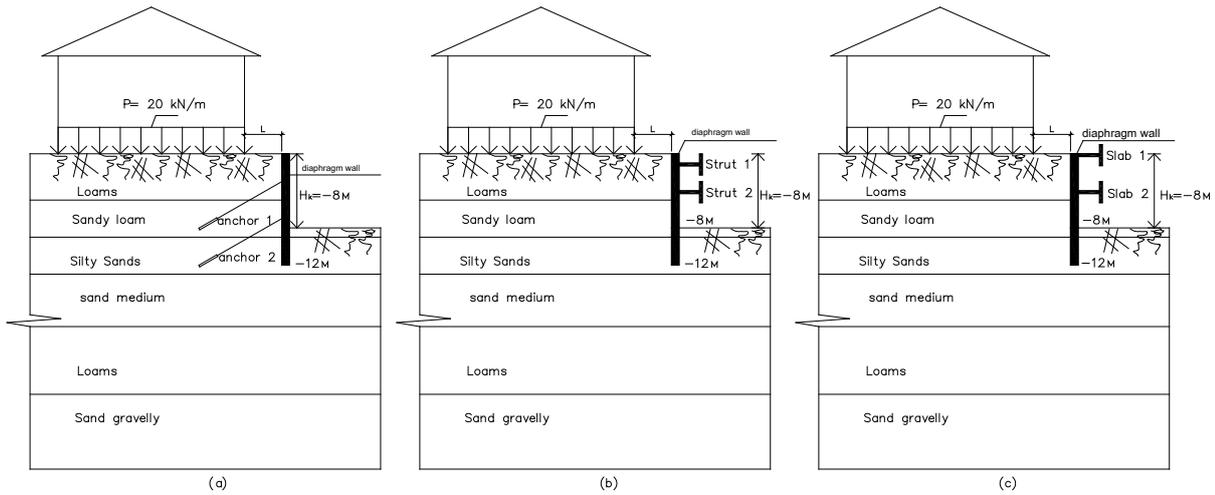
Construction of deep excavations $H_k = 8\text{m}$ by the method of anchoring in soil (a); use strut (b); Top-down construction (c).
